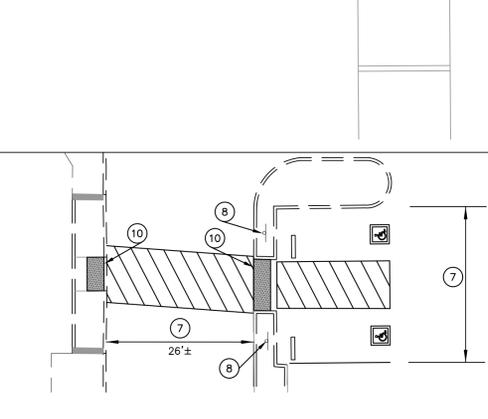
DETAIL 'A': SHADE STRUCTURE - ENLARGED VIEW SCALE:1"=15'
